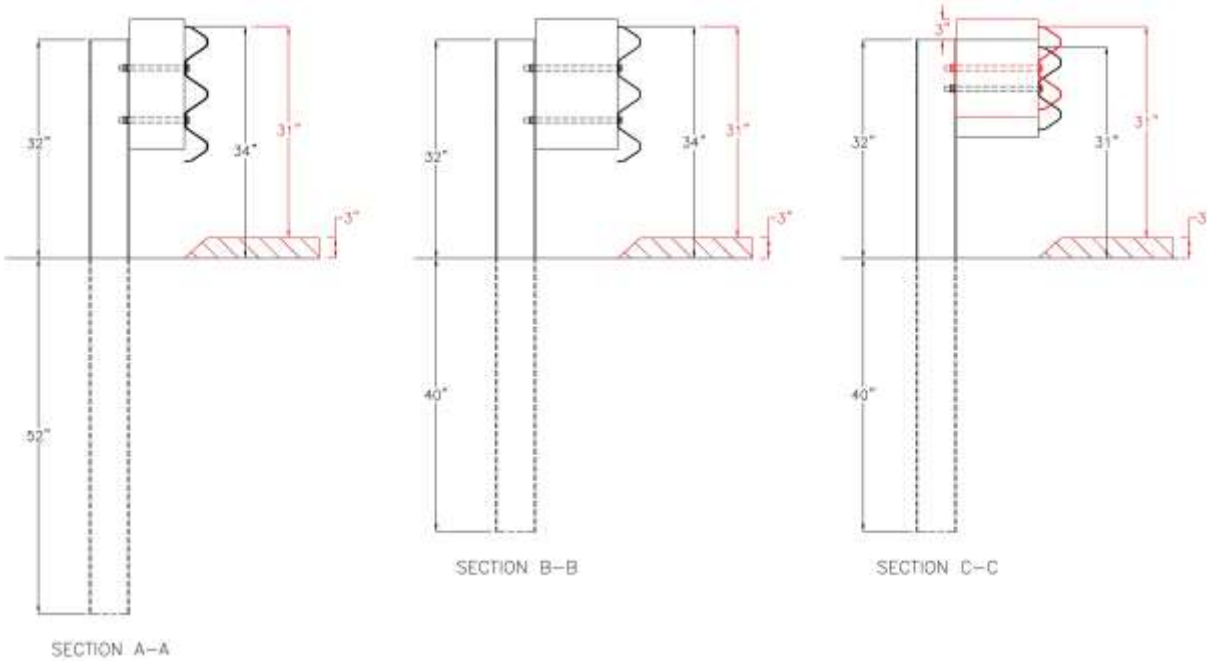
System Cross-Sections both Before and After a 3-in. Roadway Overlay
